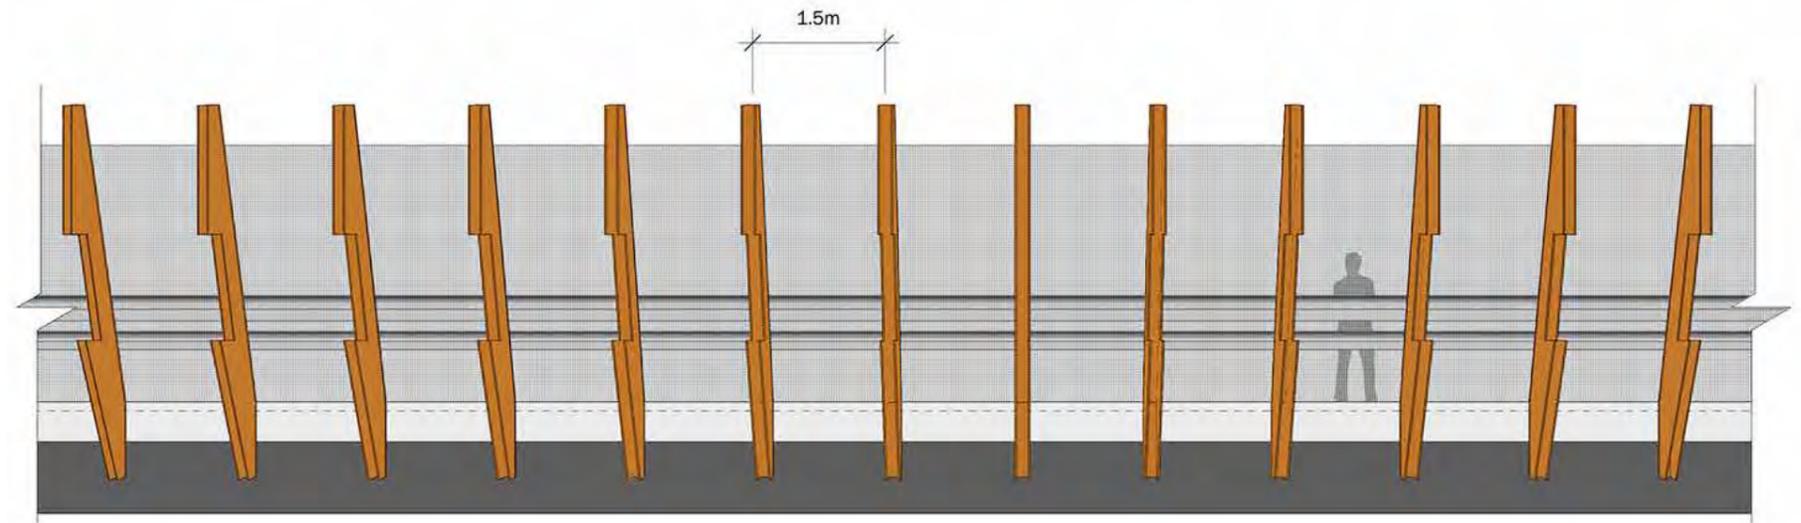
Pedestrian Bridge over Mount Ousley Road - BR02 - Elevation (Scale 1:80)
